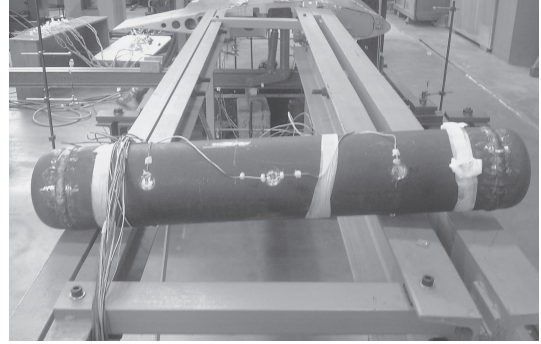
The pipe prepared for the pressure testing and machined defects with strain gauges.
